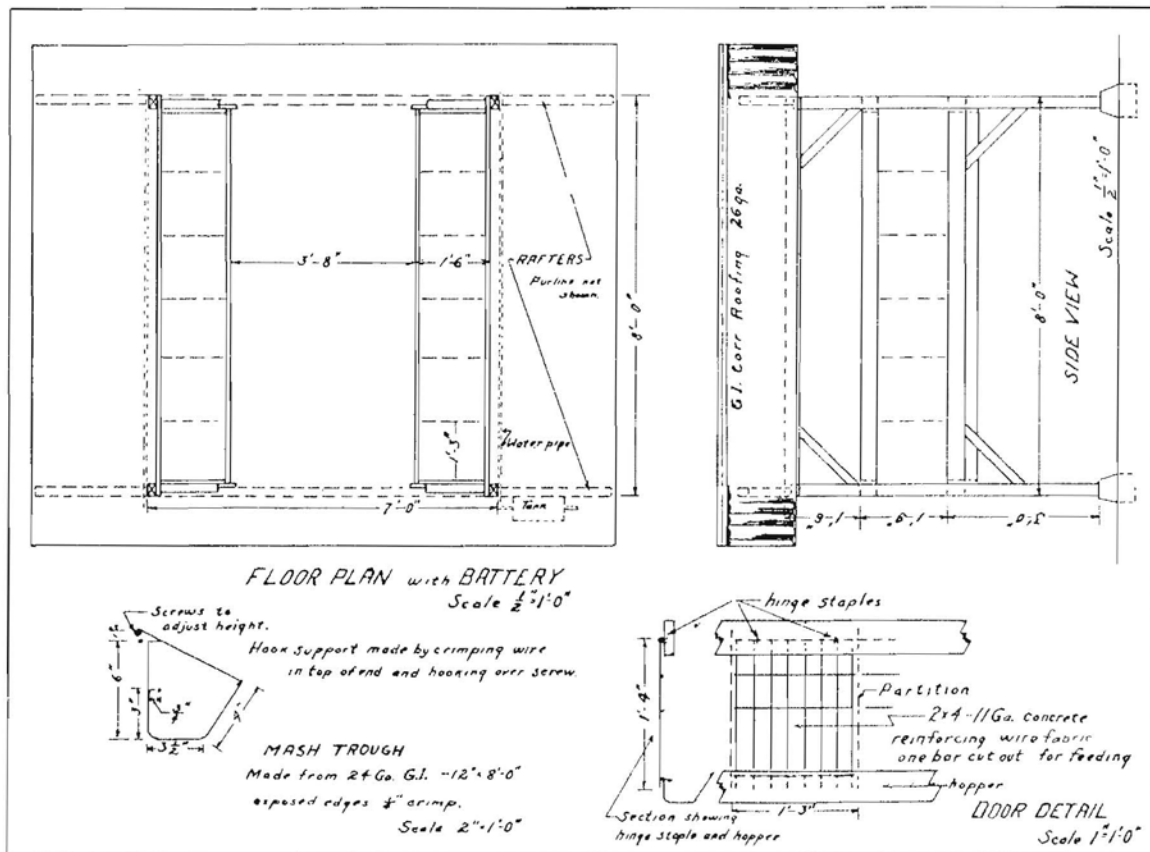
Floor plan, door detail, side view, and detail of feed hopper.
